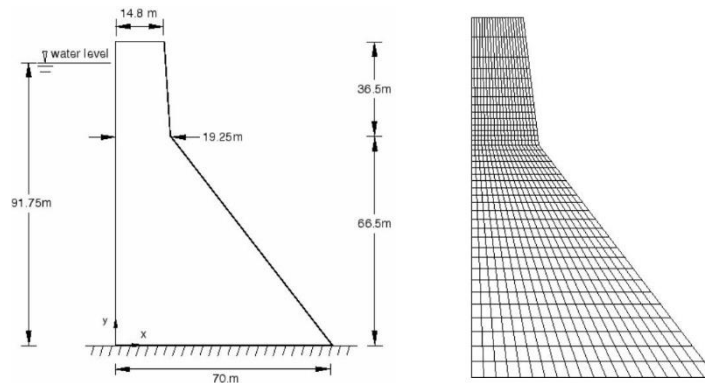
a) Koyna Dam Cross-section b) Finite Element Mesh of dam cross-section
